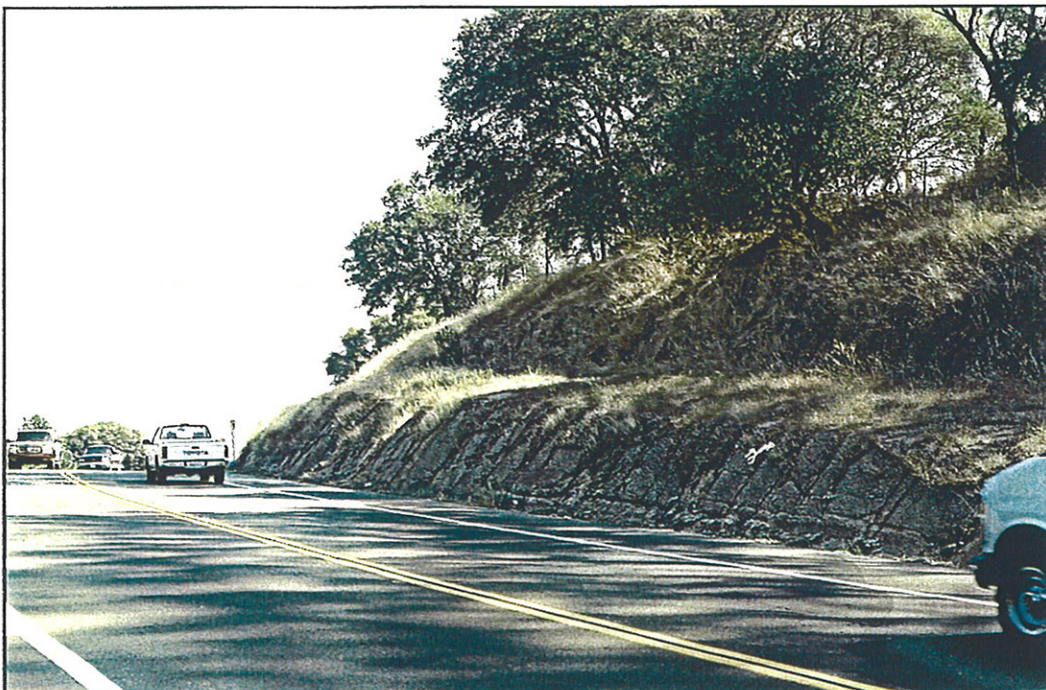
Looking northeast across Auburn-Folsom Road. Note the unvegetated road cut.
